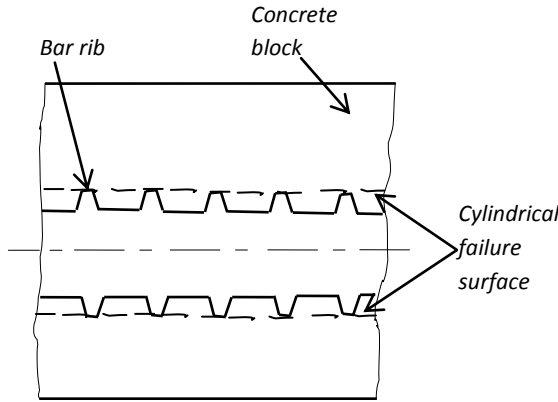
Pull out failure in reinforced concrete.
